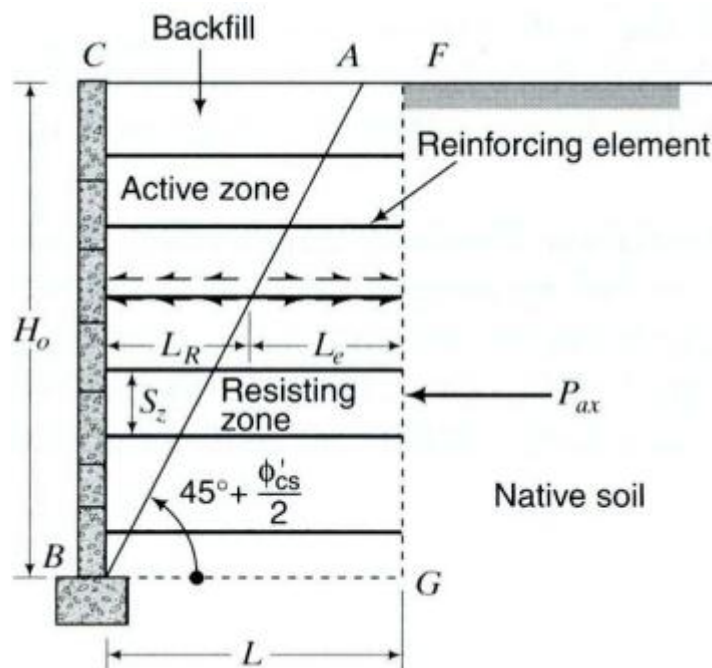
5 Forces on Earth Retaining Structure (Budha 2008)
